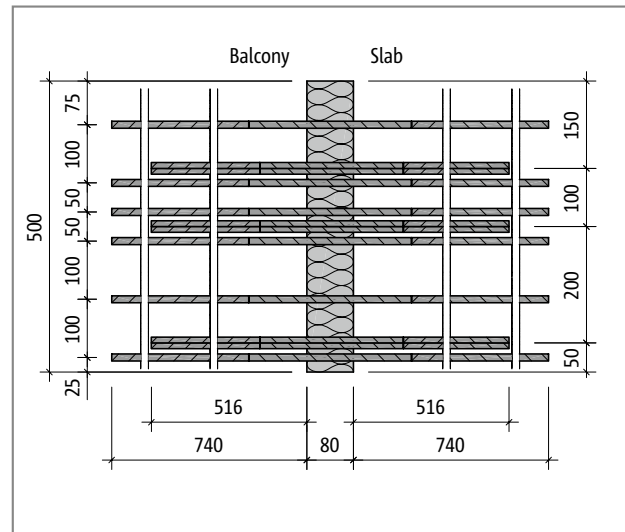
Schöck Isokorb® T type D-MM5-VV3 in length L500: Layout
